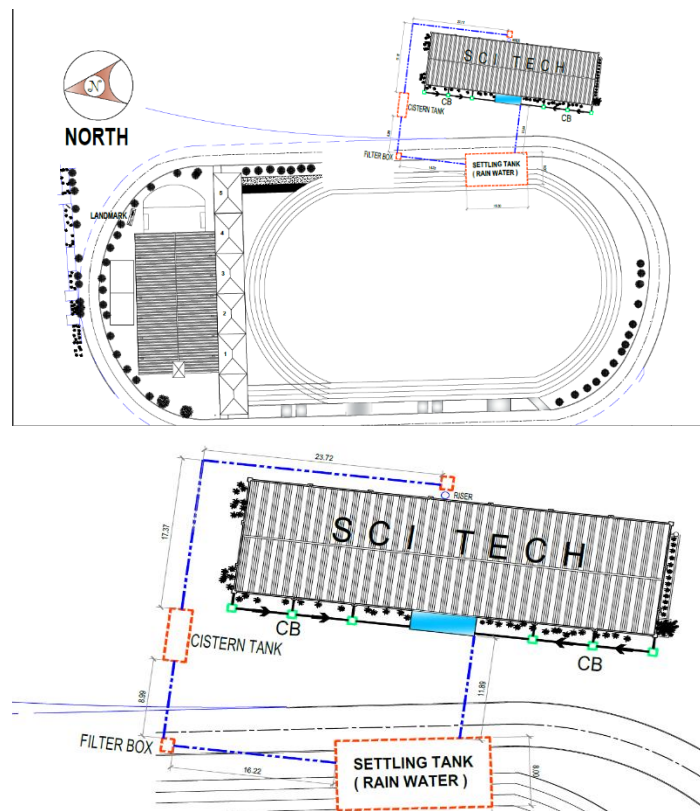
Plan for the Sci-Tech Building where the Proposed Rainwater Harvesting System will be installed.
